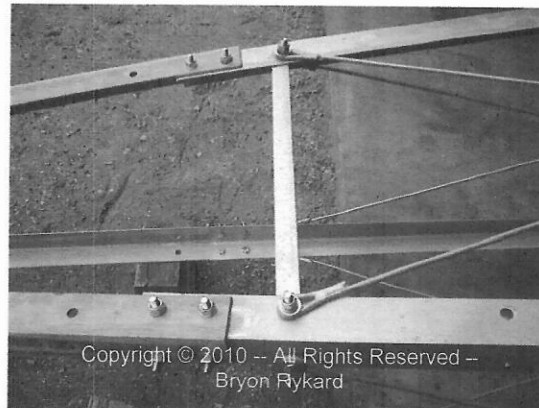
Close up of the assembled topmost girt and "X" bracing (top view)
